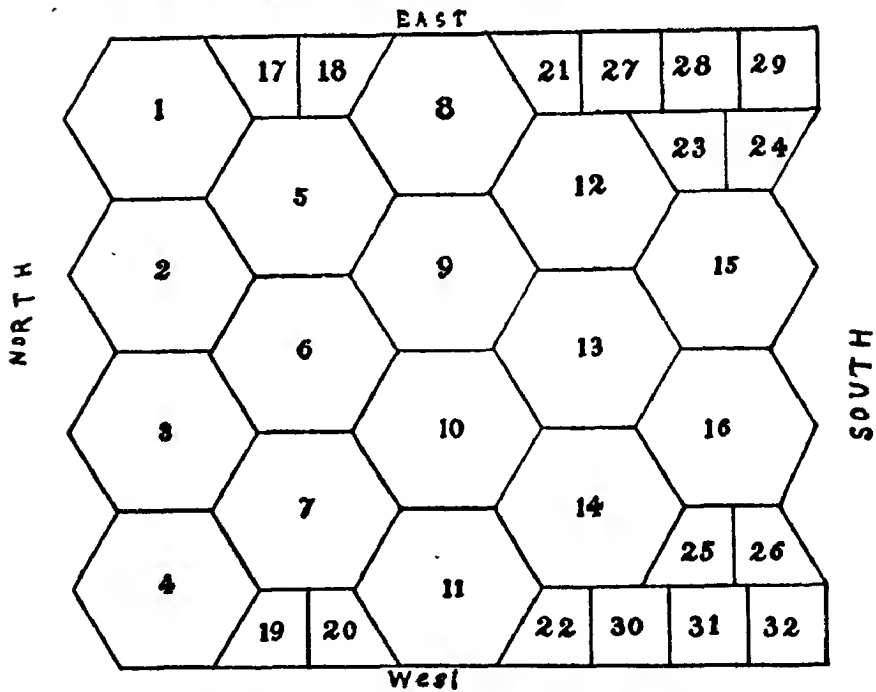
Plan of Wheat Elevator at Lyallpur.
